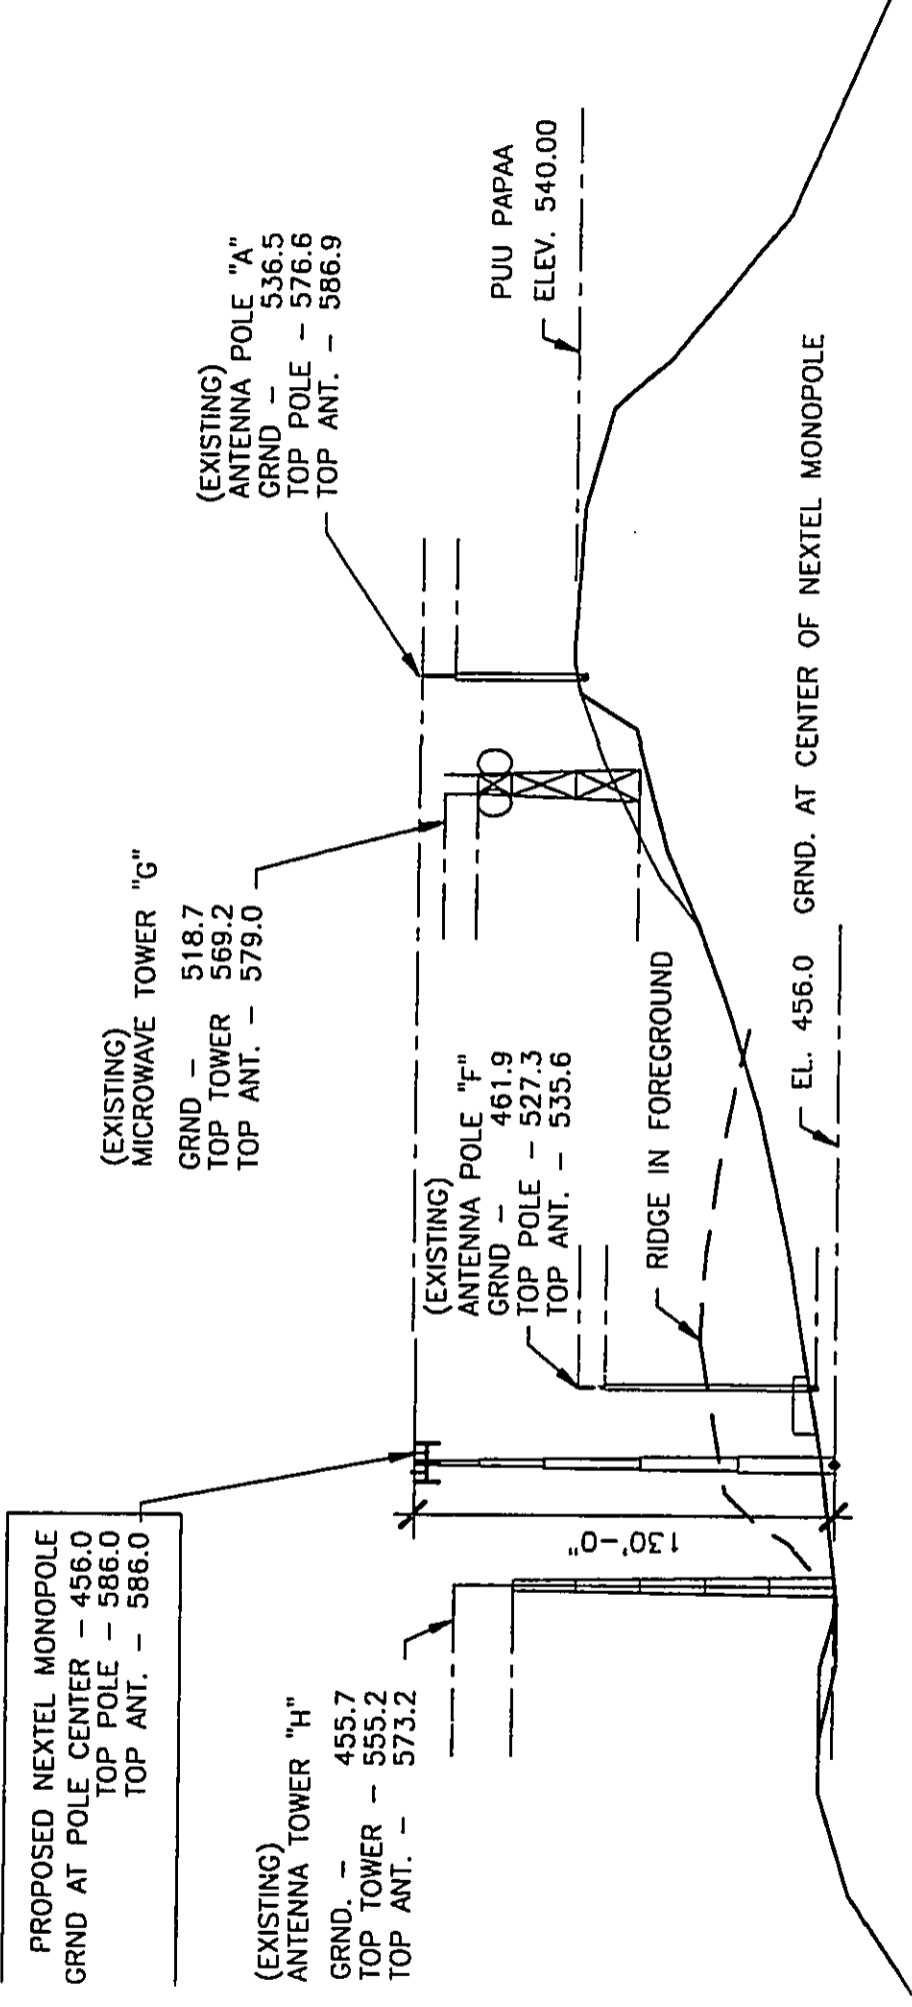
DETAIL SITE PLAN (ALTERNATIVE MONOPOLE)
